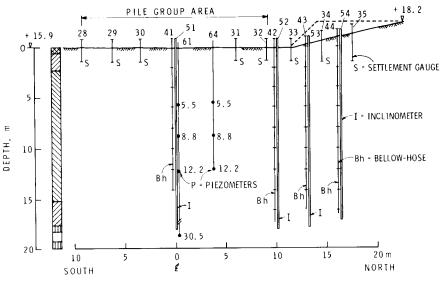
Location of instrumentation along the north-south line, silo 4.
